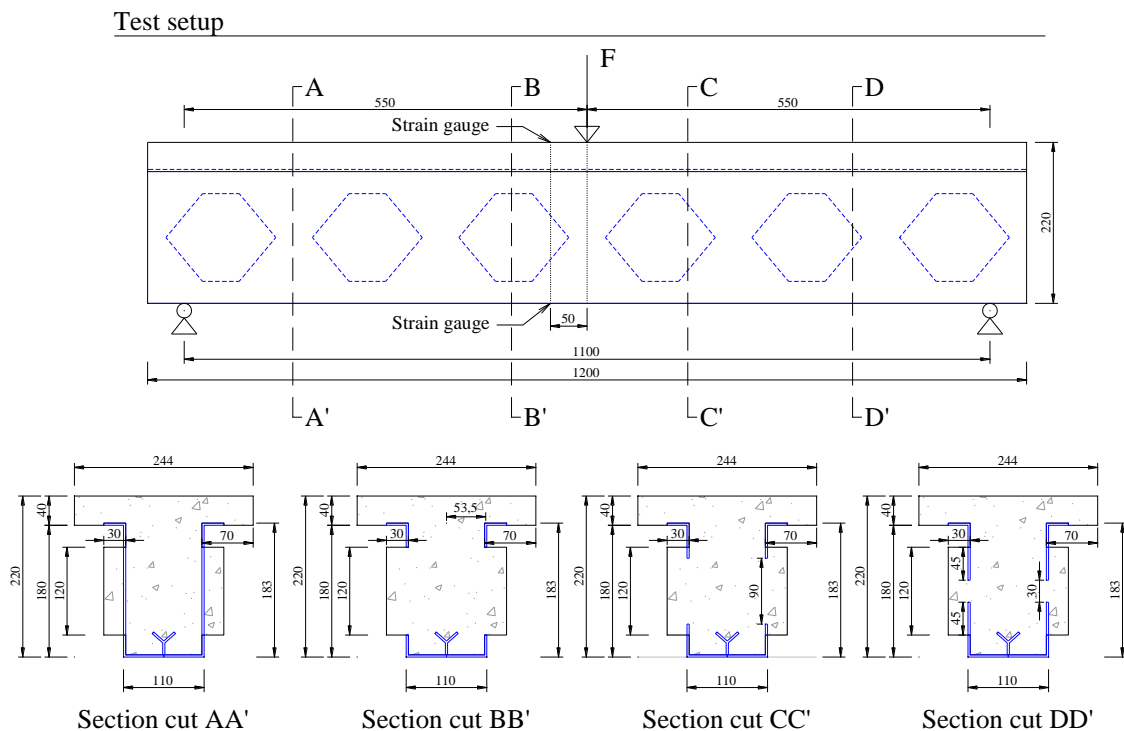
3-point bending test setup and section cuts of composite beam (dimension in mm) [113].
